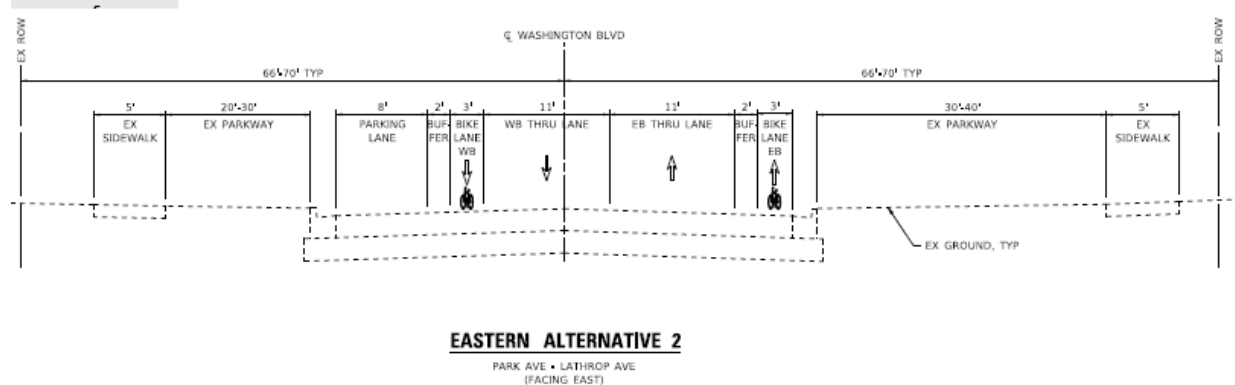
Eastern Typical Section Alternative 2 Washington Blvd.
